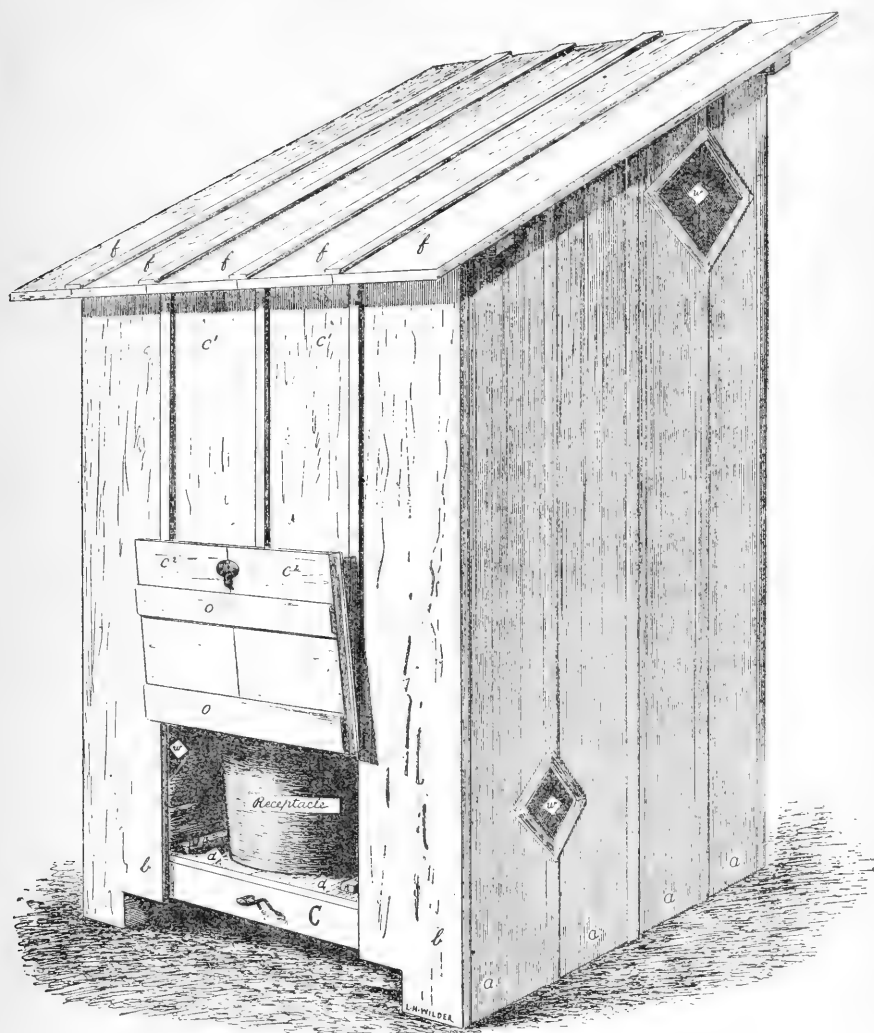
Rear and side view of a single-seated sanitary privy.
